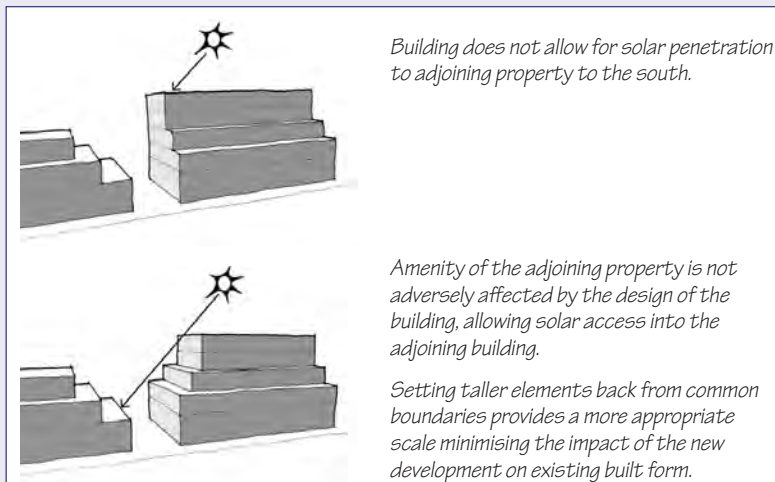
By stepping the upper levels of a building back, adequate solar access to habitable rooms and open space on adjoining property is provided.
